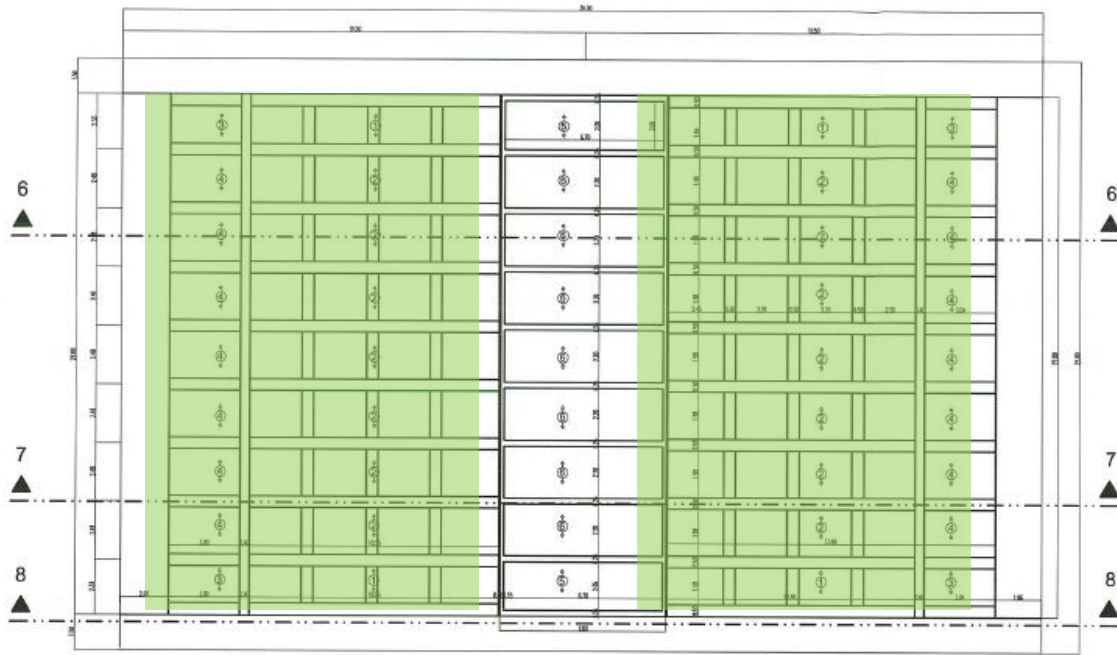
Arch slab view from bottom side and location of cantilever arch slabs
